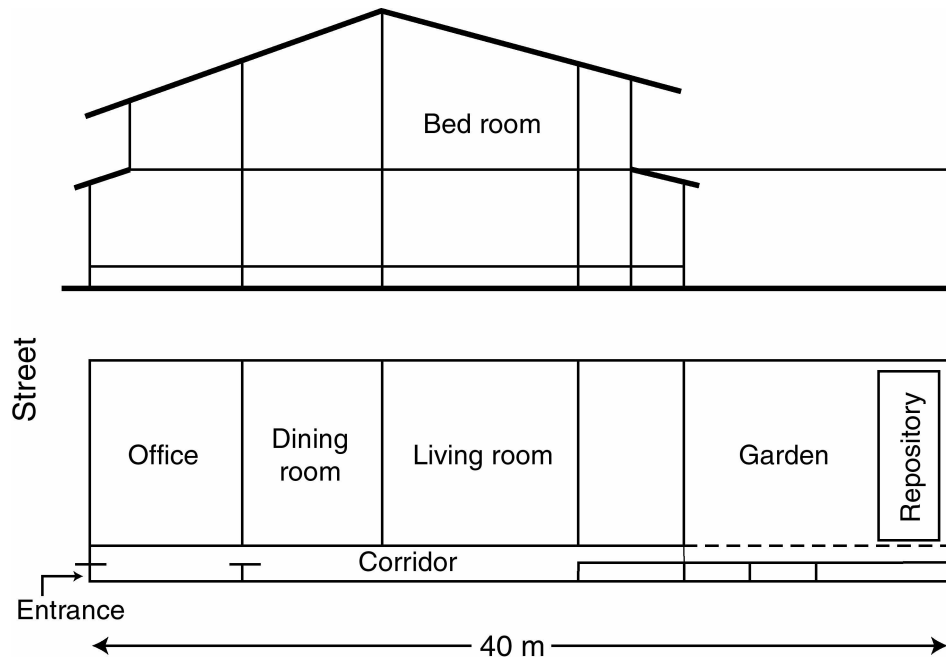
Plan and elevation of a typical large house in the study area. The depth of the house is about 40 m and width 5 to 10 m.
